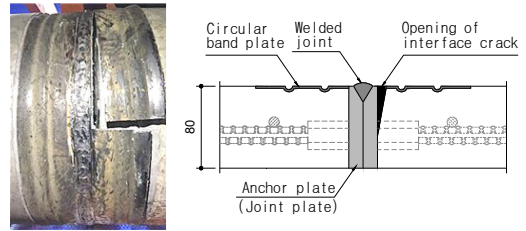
Photograph and diagram of a crack opening between concrete and joint plates[1,3]
